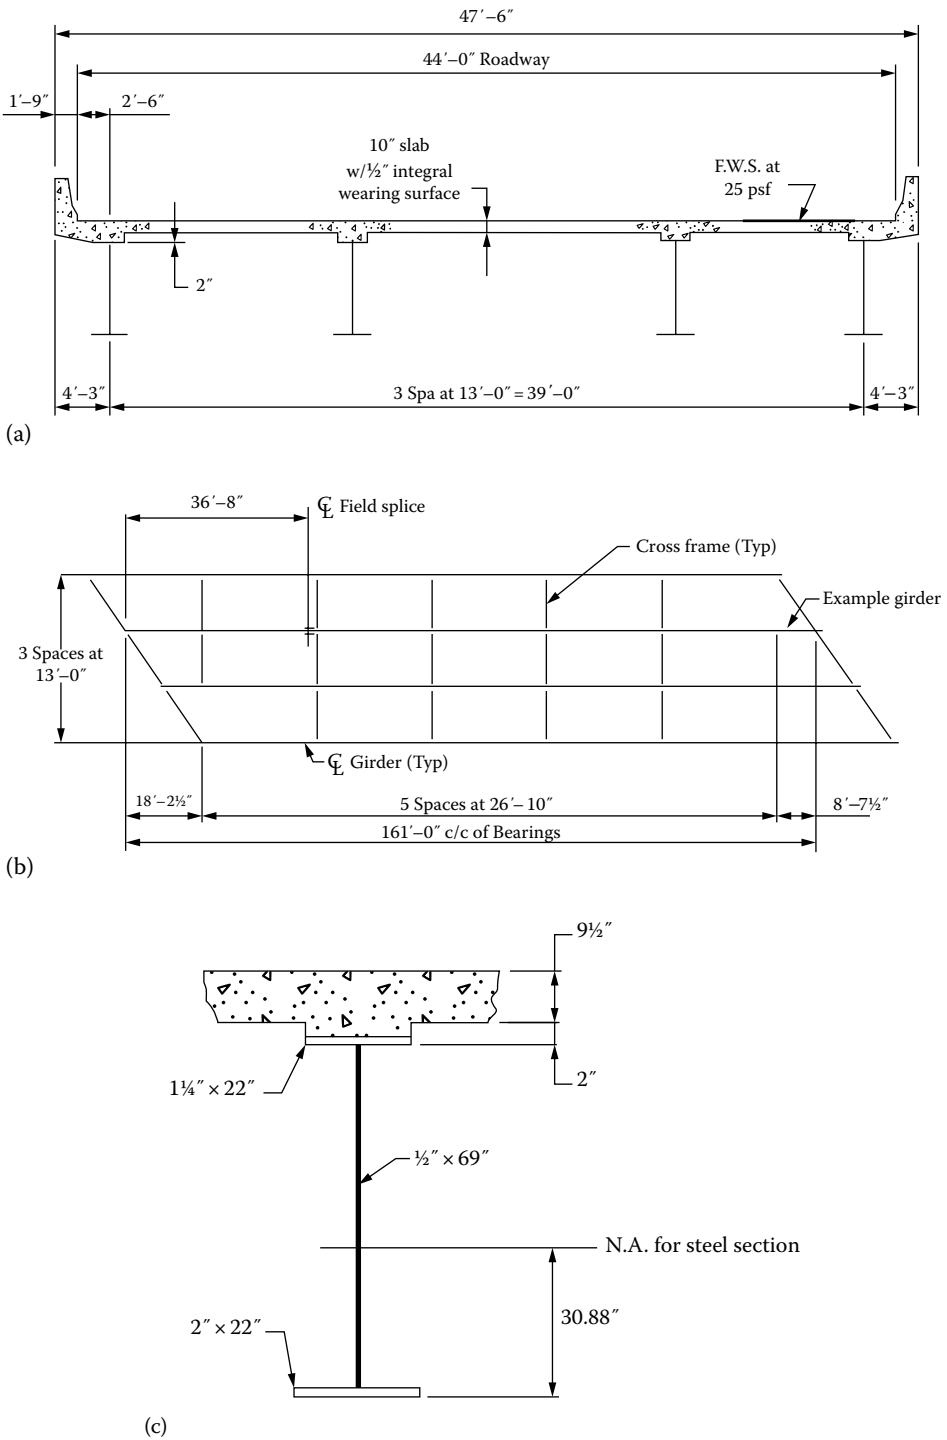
(a) Bridge cross section, (b) framing plan, and (c) girder cross section for Example 4.8. (Courtesy of American Iron and Steel Institute, Washington, DC.)
